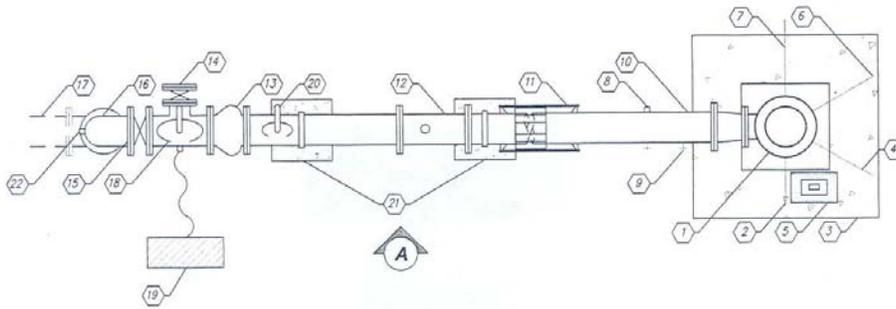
, Example Site Layout of Typical Pumping Station
